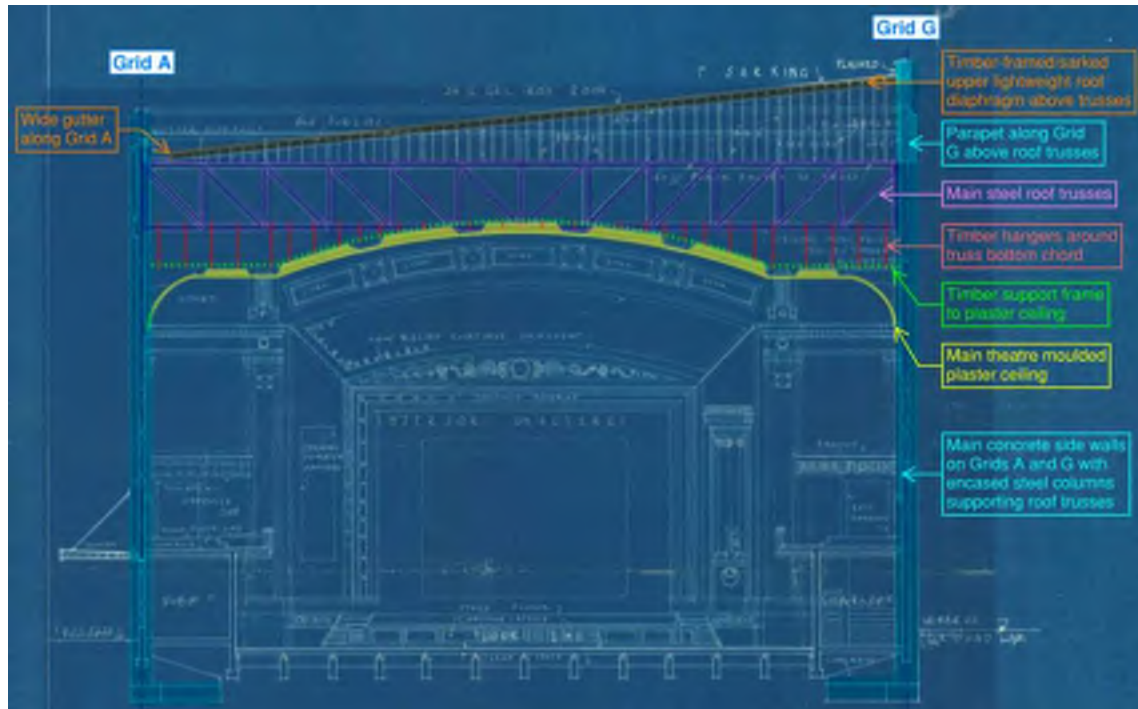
Cross-section from original drawings showing main theatre ceiling and lightweight timber roof supported on steel roof trusses, spanning to Grid A/G side walls.
